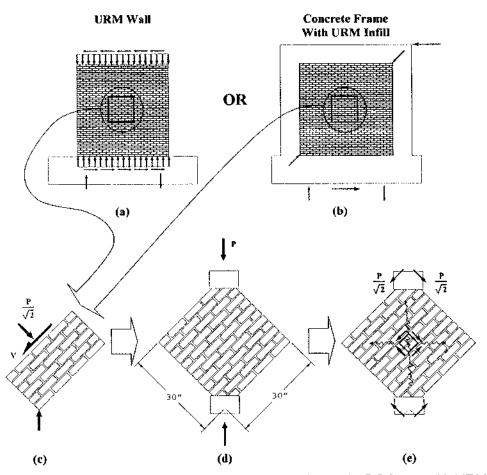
Justification of adopted testing configuration. (a) URM wall. (b) RC frame with URM infill. (c) Free body diagram of the brick panel in URM wall or URM infill prototypes. (d) Test setup. (e)
